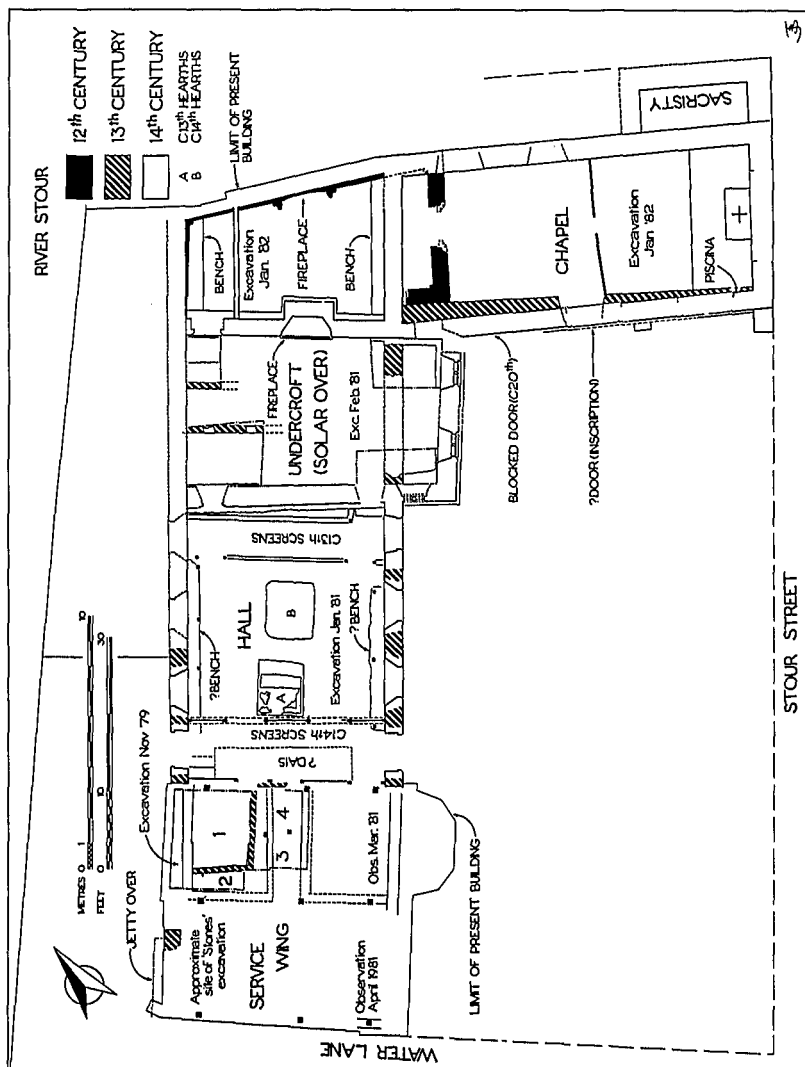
Poor Priests' Hospital: Phased Plan with Areas of Excavation.
